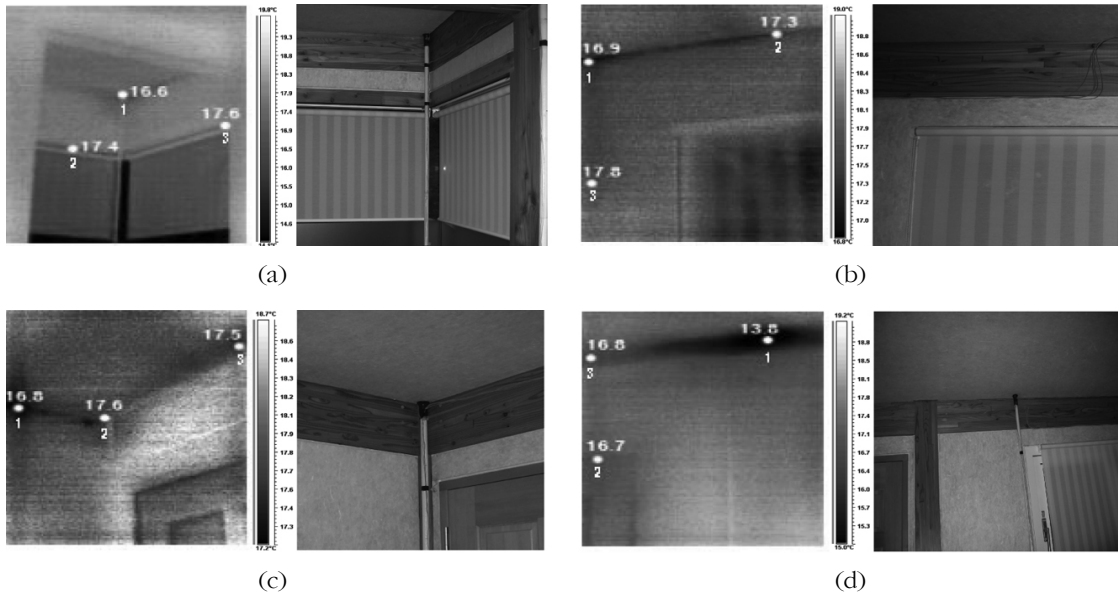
IR images of Inside walls (a) edge on the SE, (b) wall on the South, (c) edge on the SW, and (d) wall on the West.
